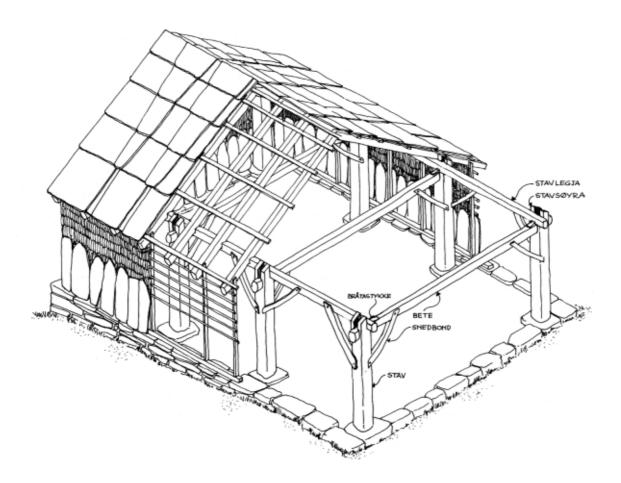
An example of a hay barn built using the Norwegian trestle-frame construction technique (isometric section).
